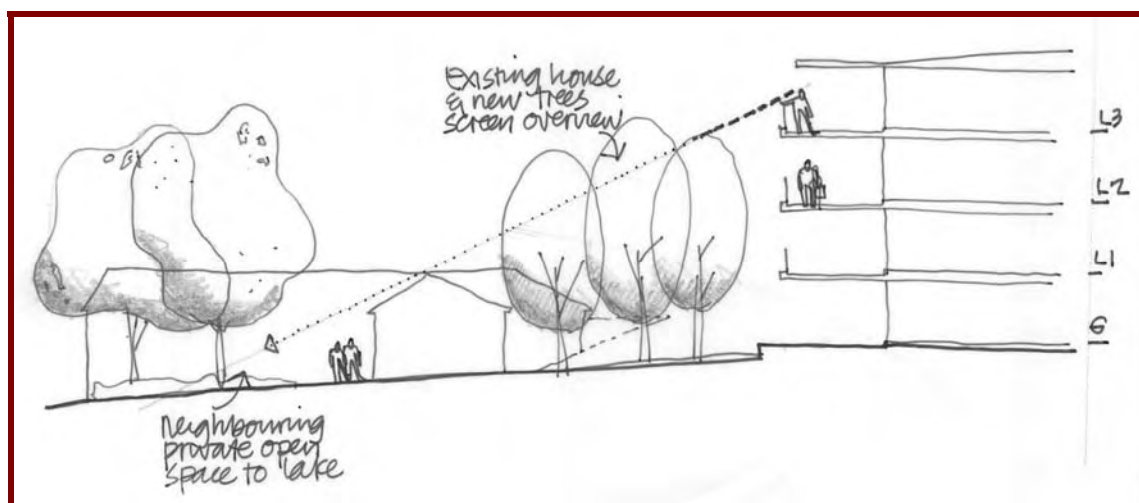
Sketch of section from closest point of building to adjoining lake side dwelling.
